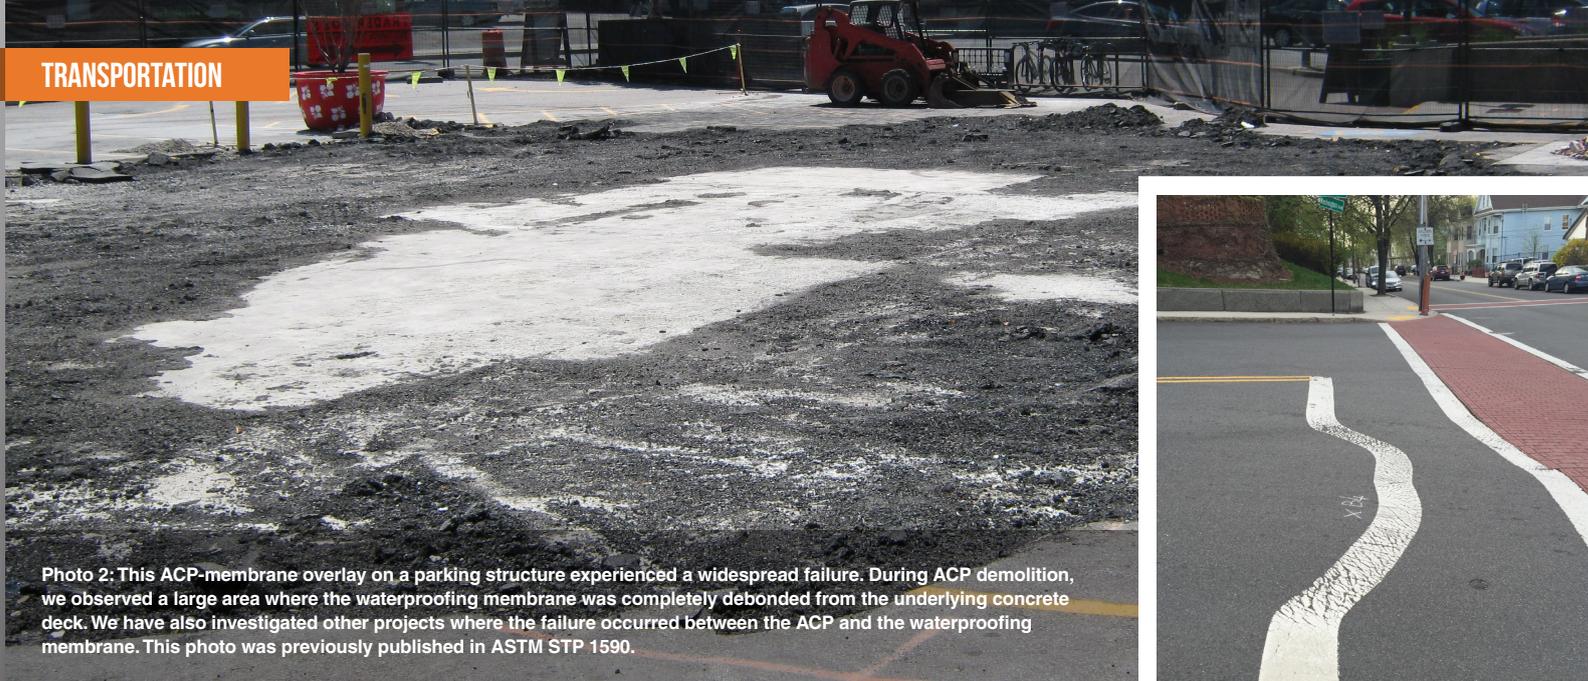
This ACP-membrane overlay on a parking structure experienced a widespread failure. During ACP demolition, we observed a large area where the waterproofing membrane was completely debonded from the underlying concrete deck. We have also investigated other projects where the failure occurred between the ACP and the waterproofing membrane. This photo was previously published in ASTM STP 1590.
